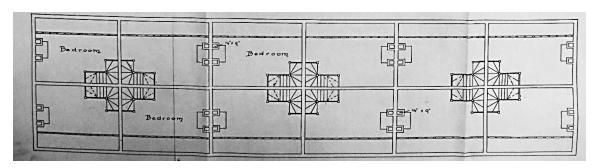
The attic room was open to the staircase (Carby Hall 1897a).
